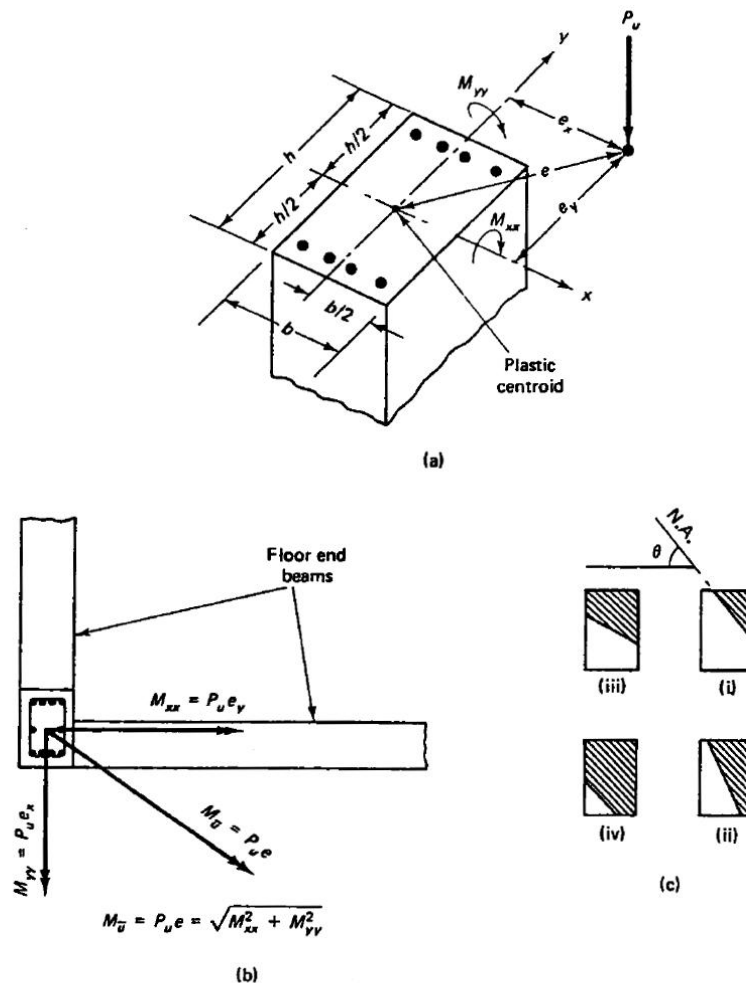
Corner column subjected to axial load. (a) Biaxially stressed column cross section. (b) Vector moments M_{xx} and M_{yy} in column plan. (c) Neutral axis direction.
